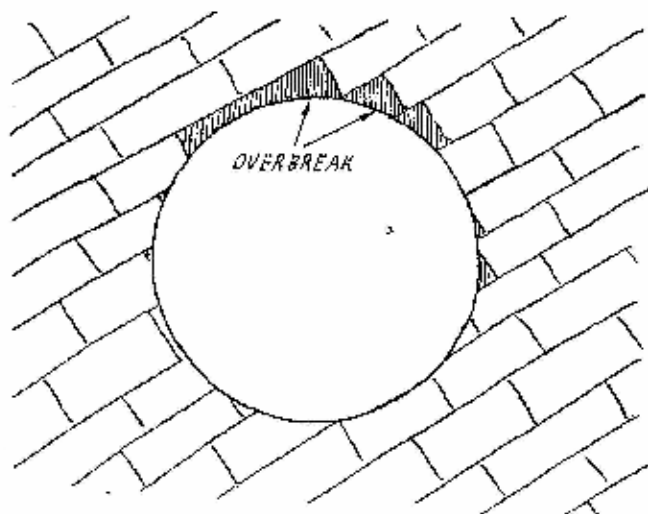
'Overbreak' in a tunnel excavation in well-jointed rock. (See also Plate V.)
